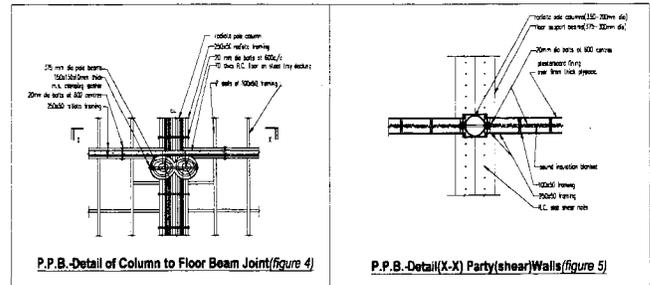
Prototype Pole Building - left, detail of column to floor beam joint; right, detail (X-X) party (shear) walls.
